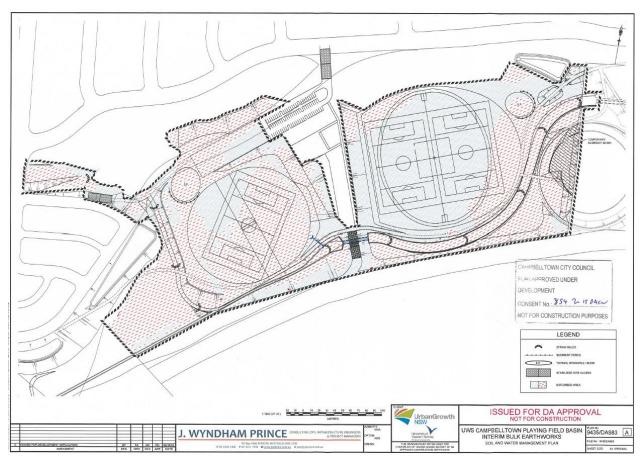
Bulk Earthworks DA - approved plan extract (Source: J. Wyndham Prince)
